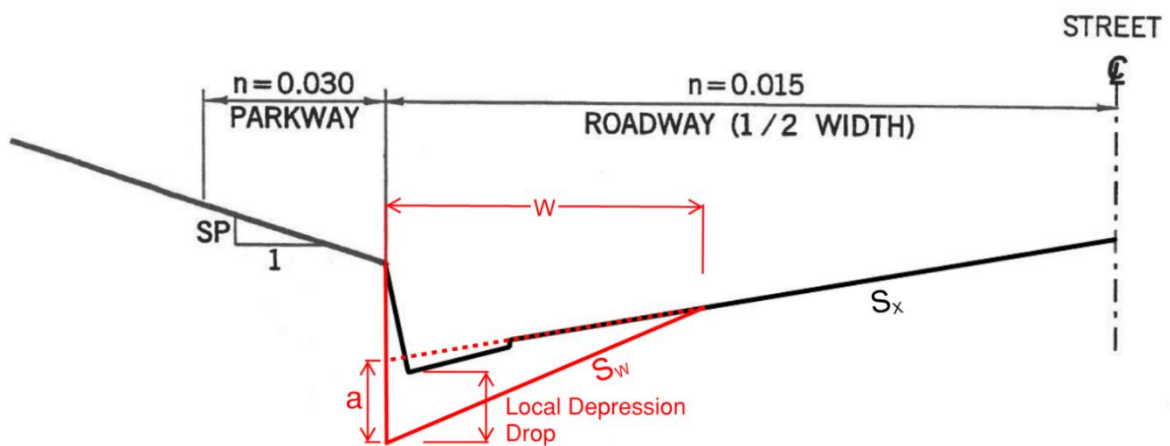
Typical FHWA Curb Opening Inlet Cross Section
